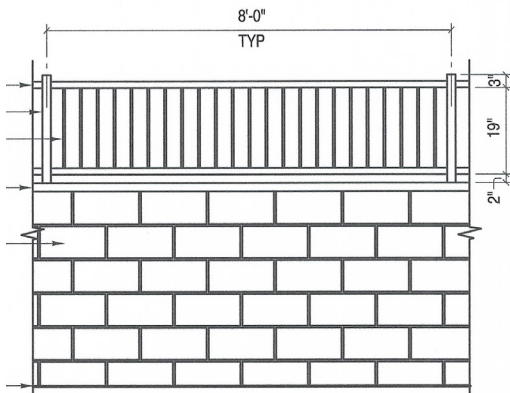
A—AMENDMENT AREA WALL & FENCE PLAN
